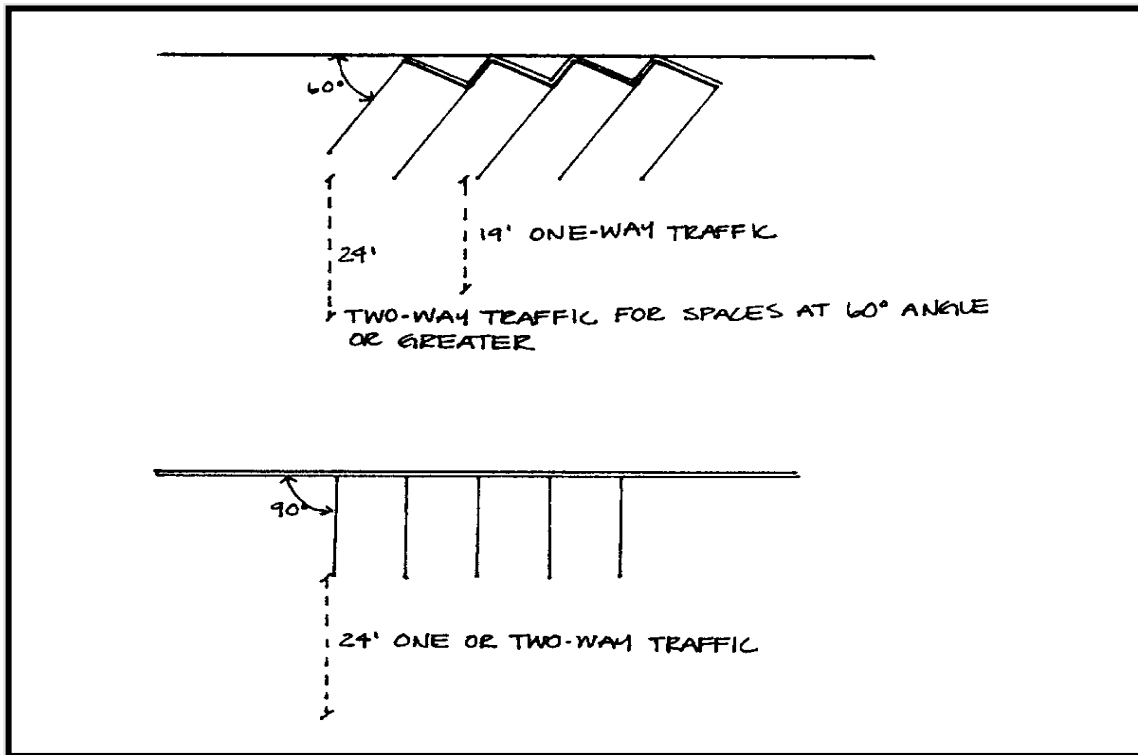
Parking Aisle Dimensions for angled parking spaces of 60 and 90 degrees.
